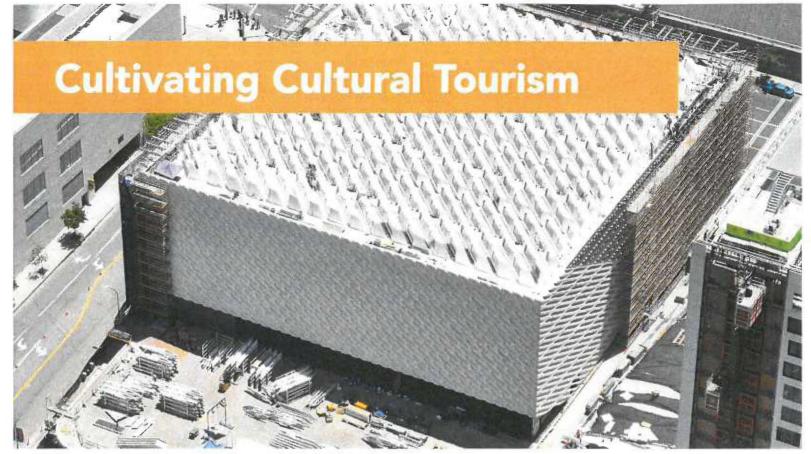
PHOTO ABOVE: Aerial construction image of The Broad museum's back façade
